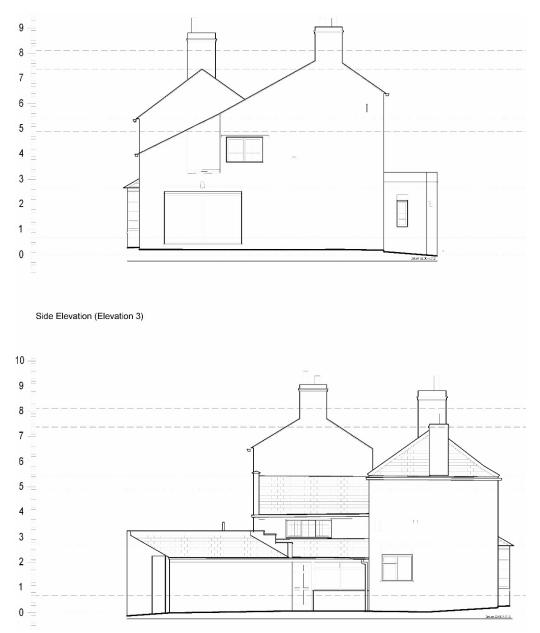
South-west (top) and north-east (lower) facing elevations Supplied by Staniforth Architects. Metre scale on left of drawing
